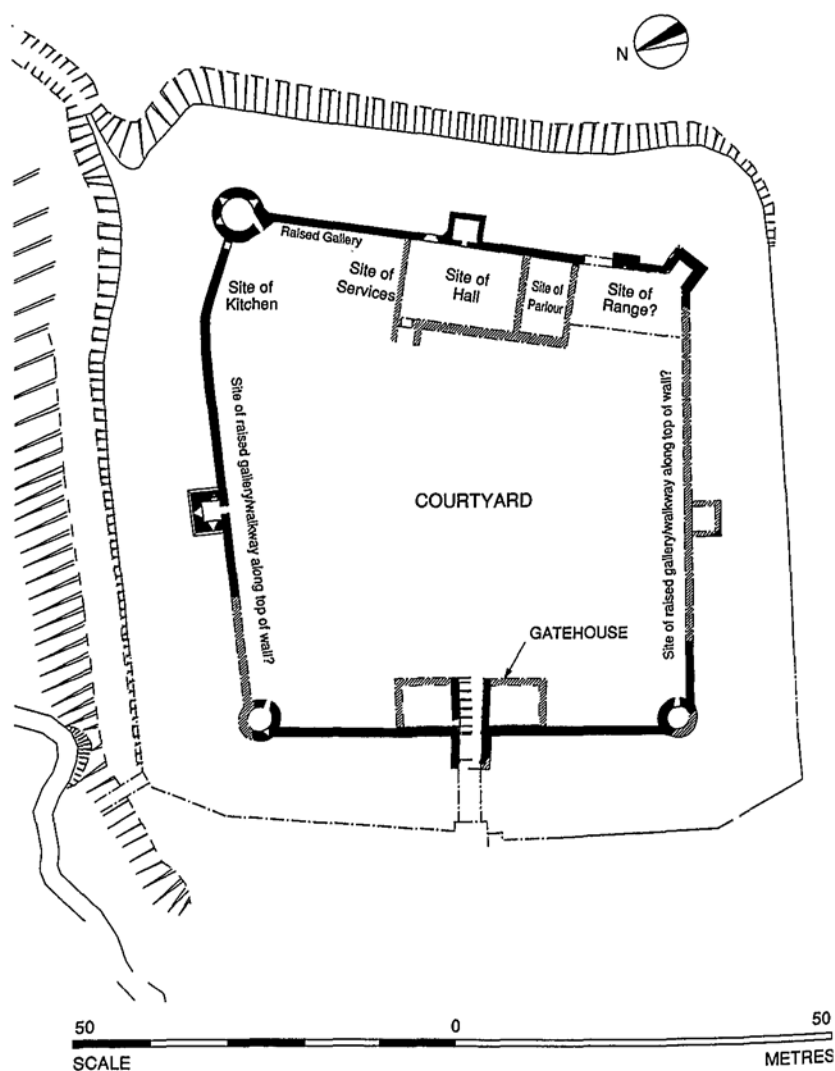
Reconstruction plan of the site as during the late-fourteenth century
